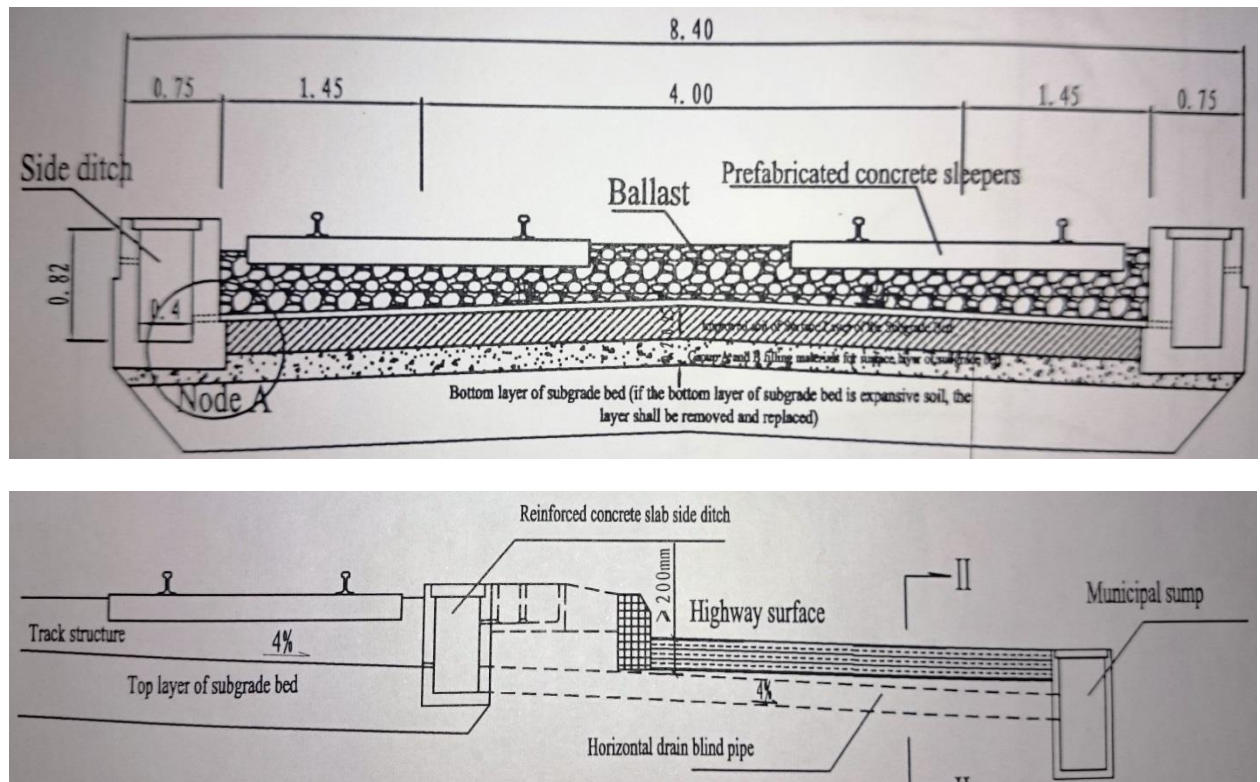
The drainage systems of the railway track and pipe connections with AACRA manholes
